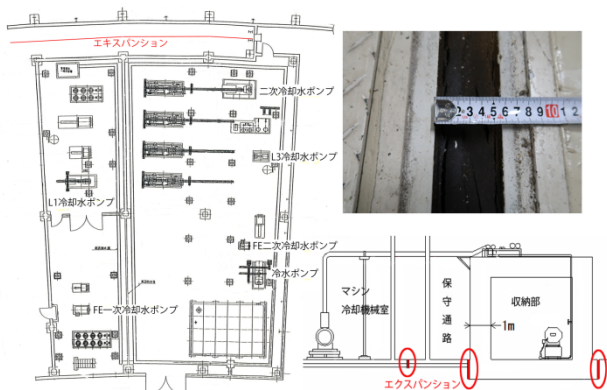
(Left) Positions of pumps. (Right up) Photo of expansion. (Right down) Cross sectional view.
